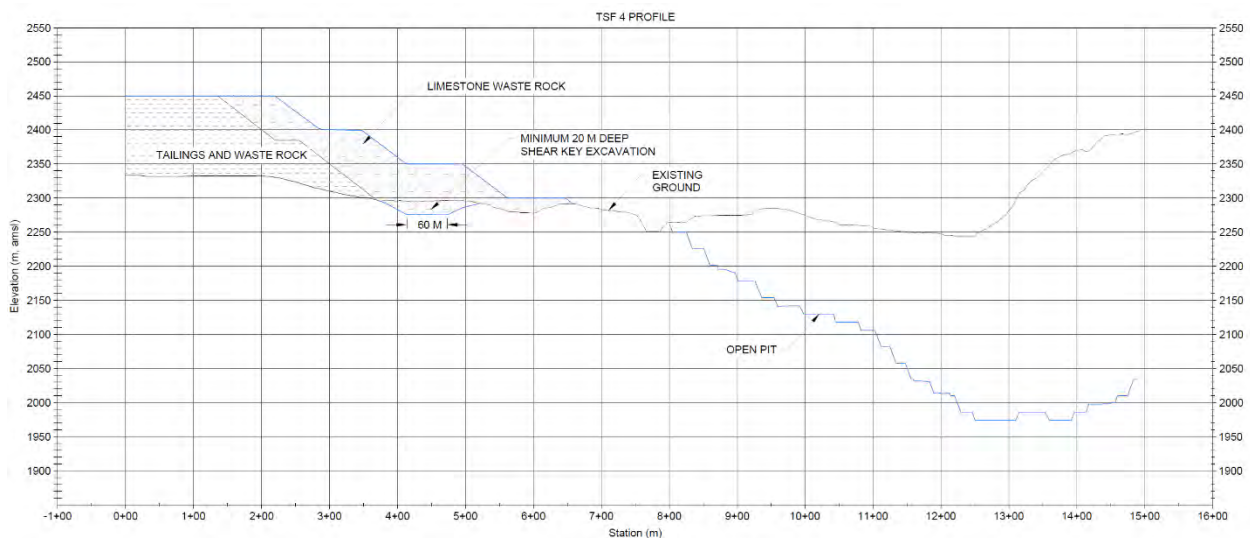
West Tailings and Rock Storage Facility Southern Portion Cross Section - LOM Author SRK, 24 January 2019.
